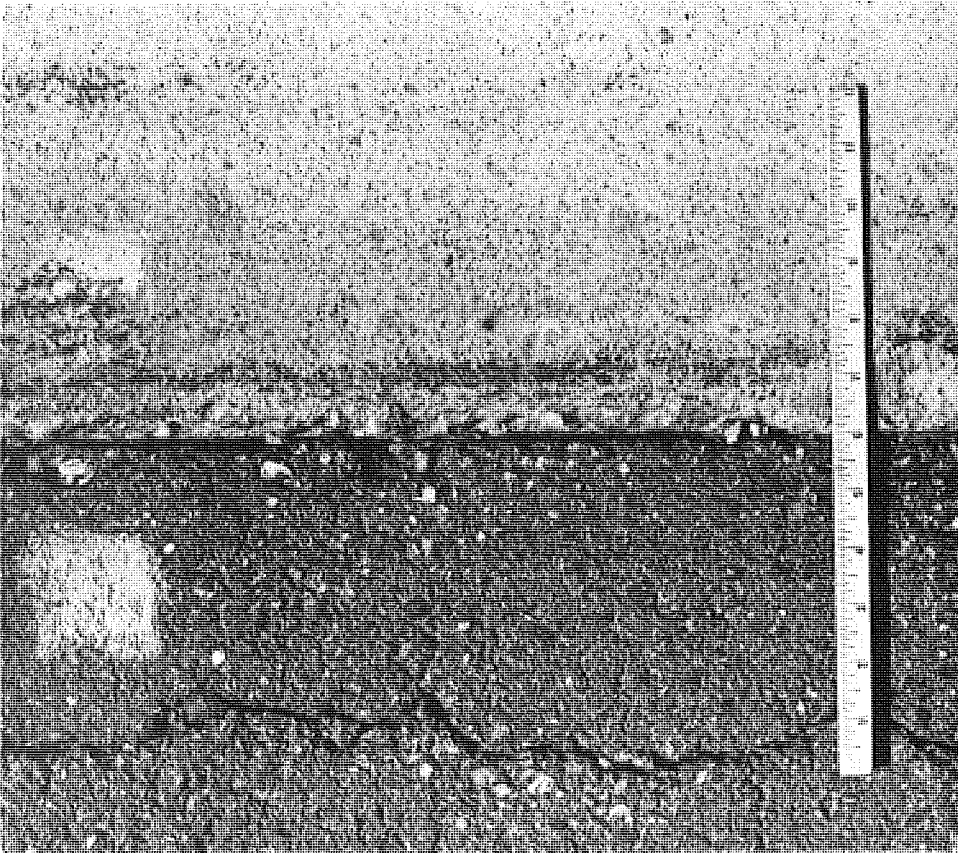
Typical cross-section of an outside (traffic lane) Class AA shoulder.
